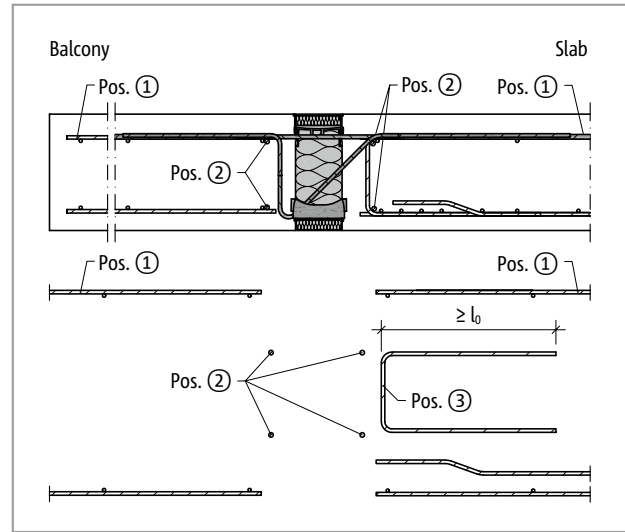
Schöck Isokorb® T type K-M1 to M11: On-site reinforcement with indirect support
